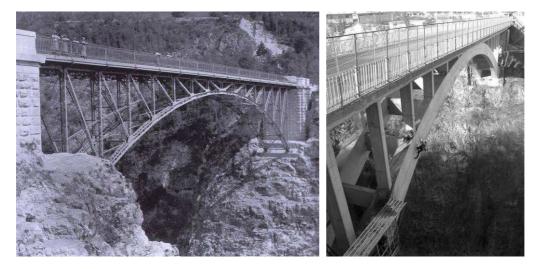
S.Giustina bridge: (a) original bridge - year 1888; (b) reinforced bridge-year 2010.
